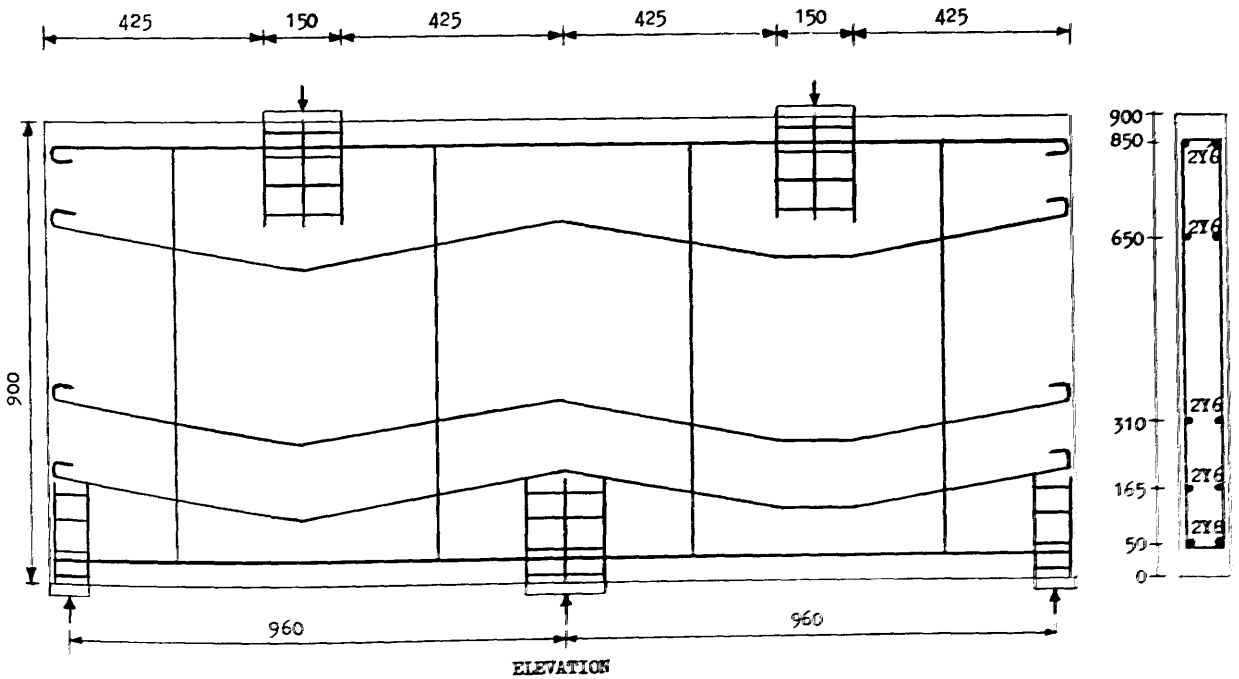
Dimensions and reinforcing details of girder TRGRAS5
